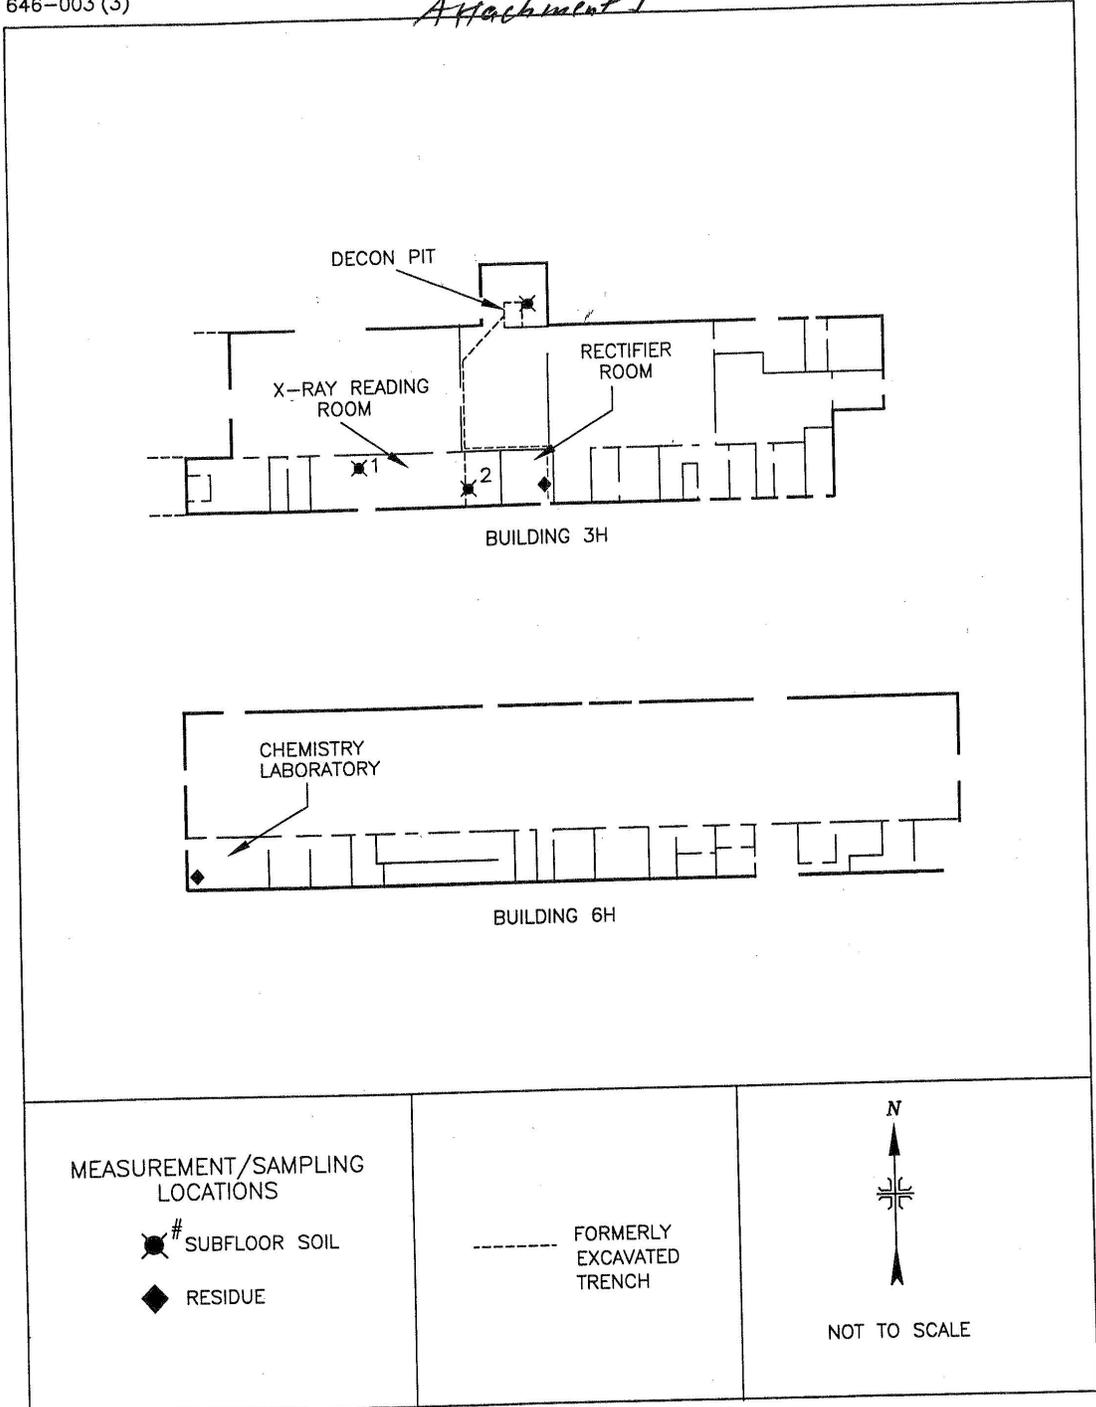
Floor Plan of Buildings 3H and 6H – Sampling Locations
